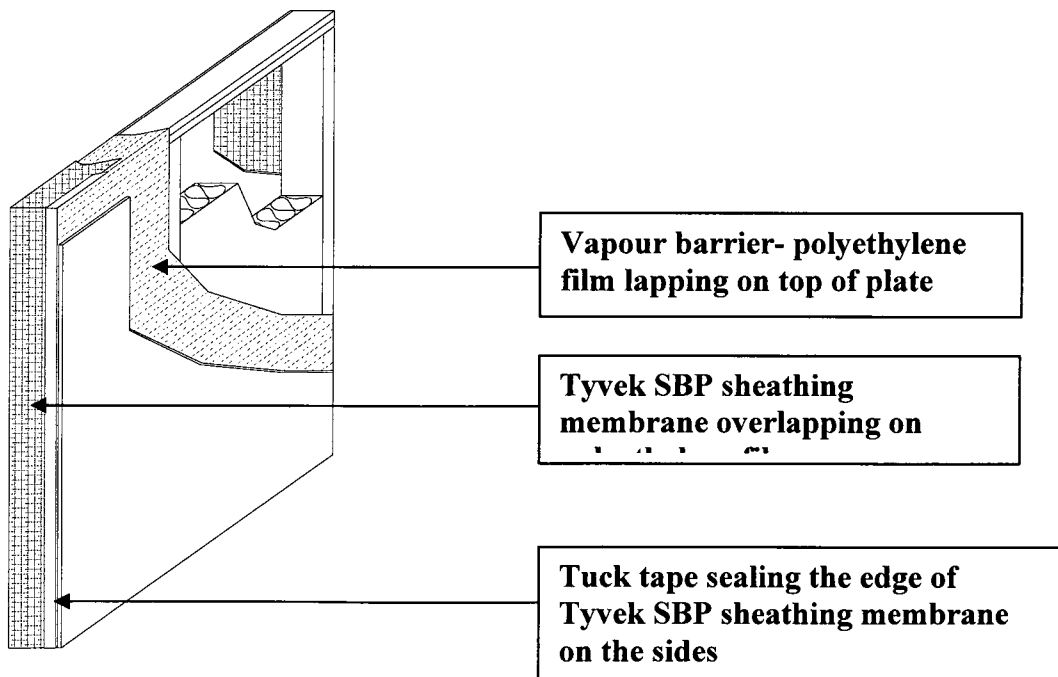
An isolated and sealed wood frame back wall unit.
